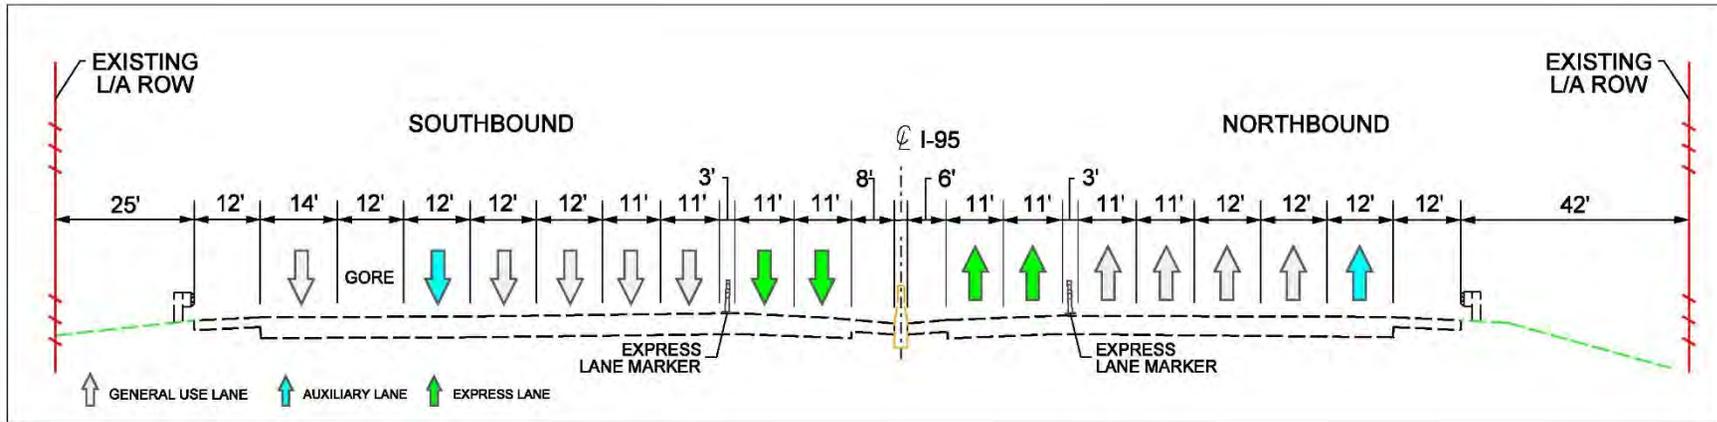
I-95 Roadway Section North of Hallandale Beach Boulevard
